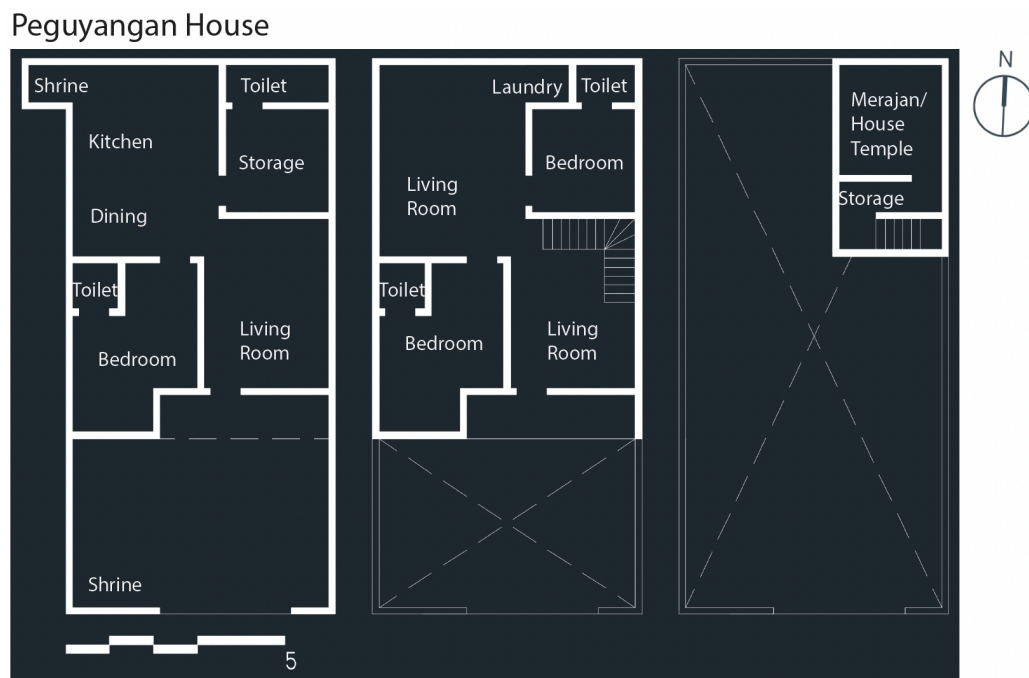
Pak KS's urban house plan. The scale is in meters. Drawing developed by the author.
